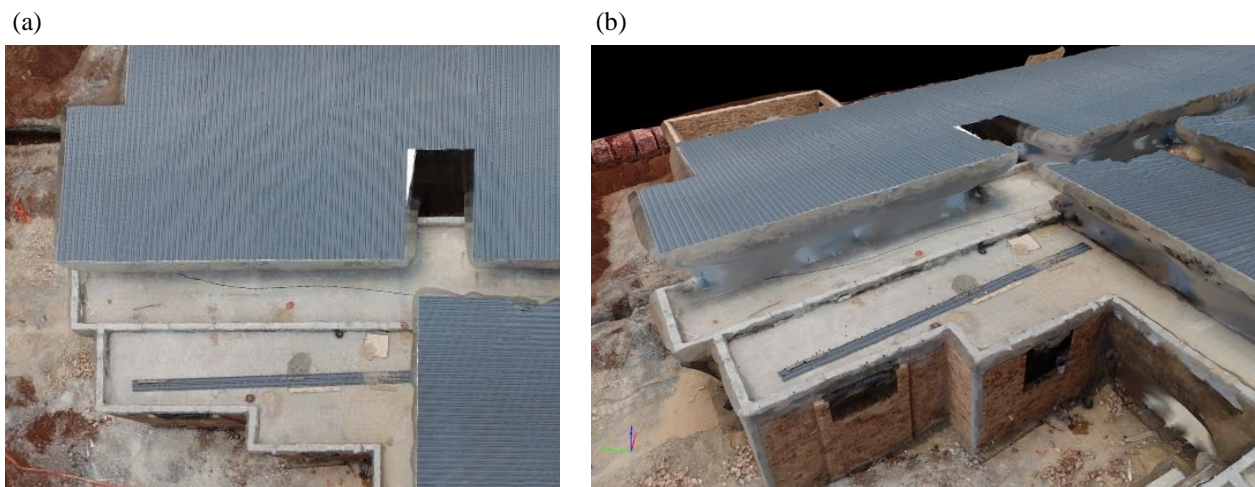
(a) 2D View of slab to be inspected; (b) 3D View of slab to be inspected
